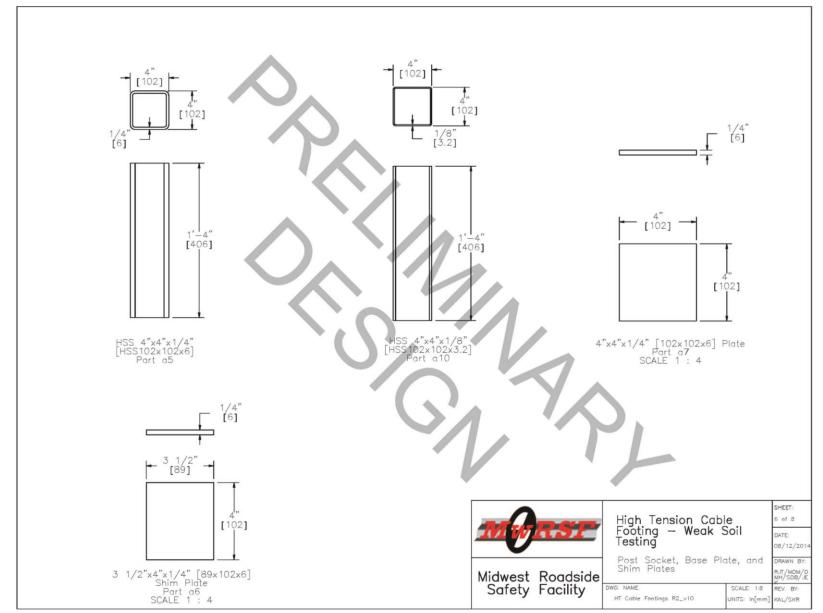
Steel Tube Details, Test Nos. HTCB-5 through HTCB-9
